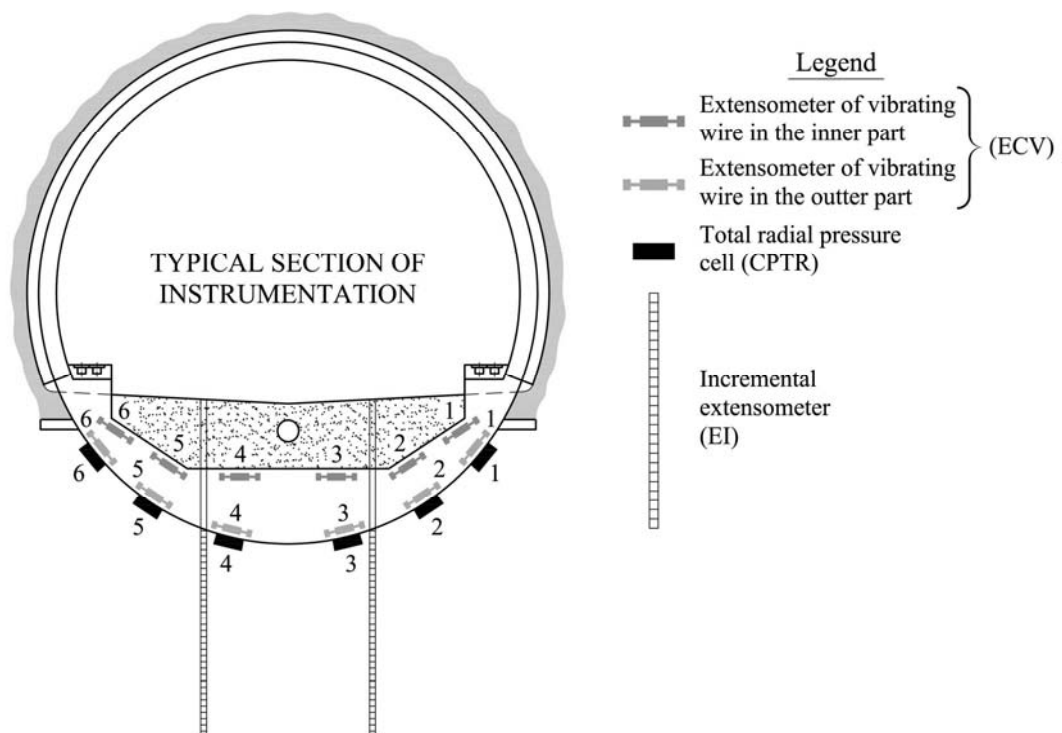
Typical instrumented section of reinforced tunnel with instruments installed only in invert
